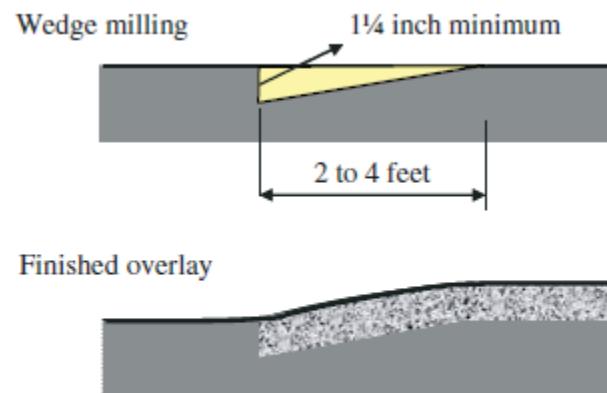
Wedge milling to key-in a 2-in.-thick AC patch.
